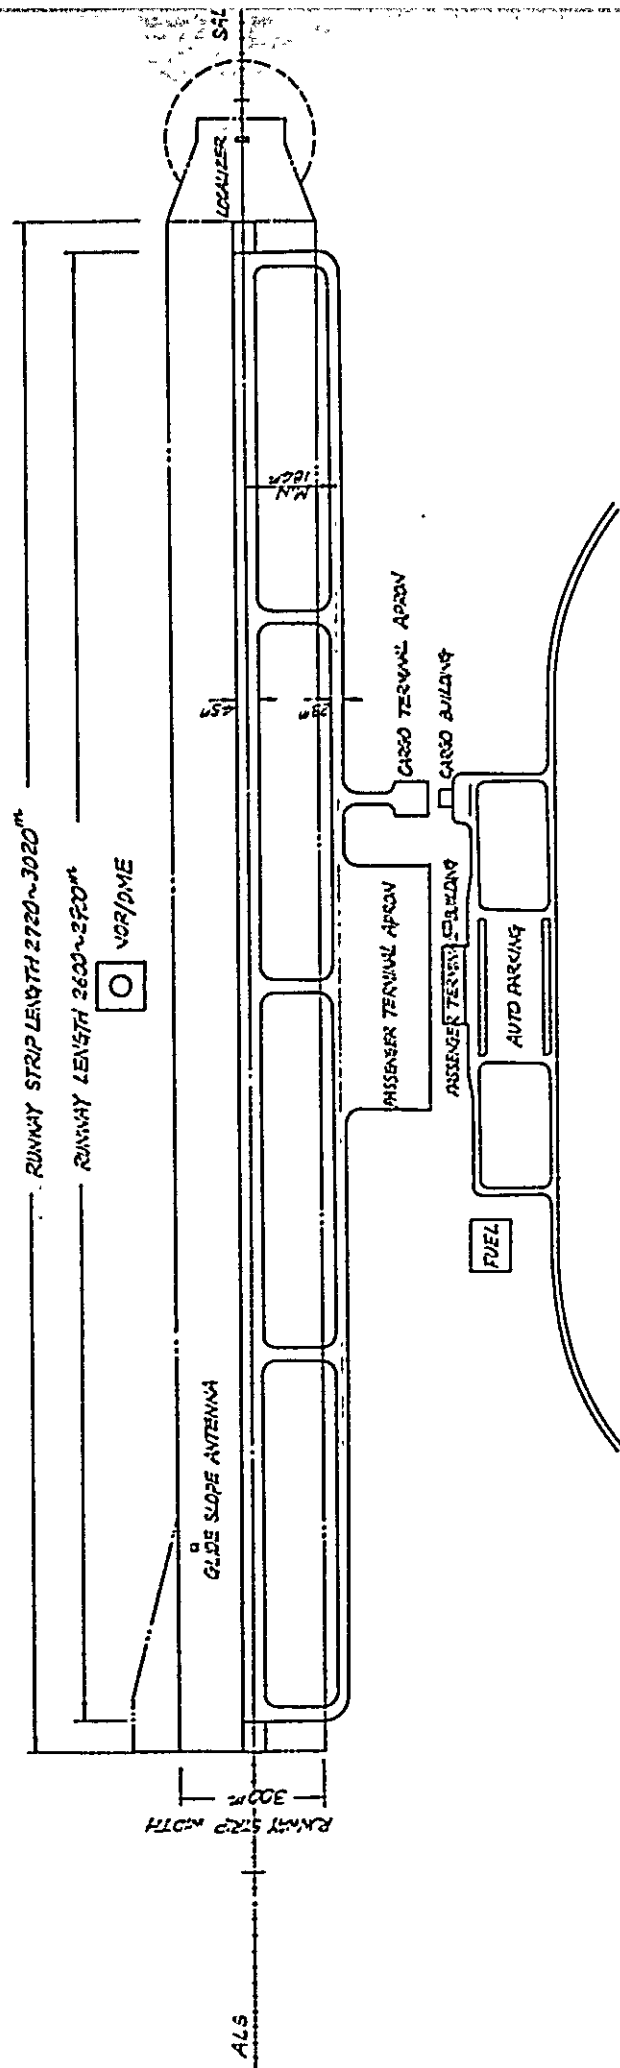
CONCEPTUAL LAYOUT PLAN
